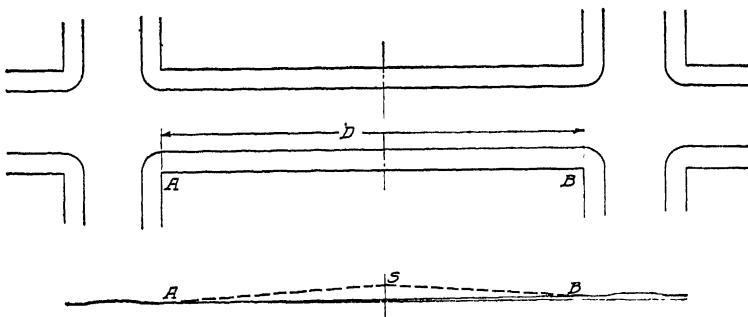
Diagrams for Calculating "Accommodation Summits" between Street Intersections
